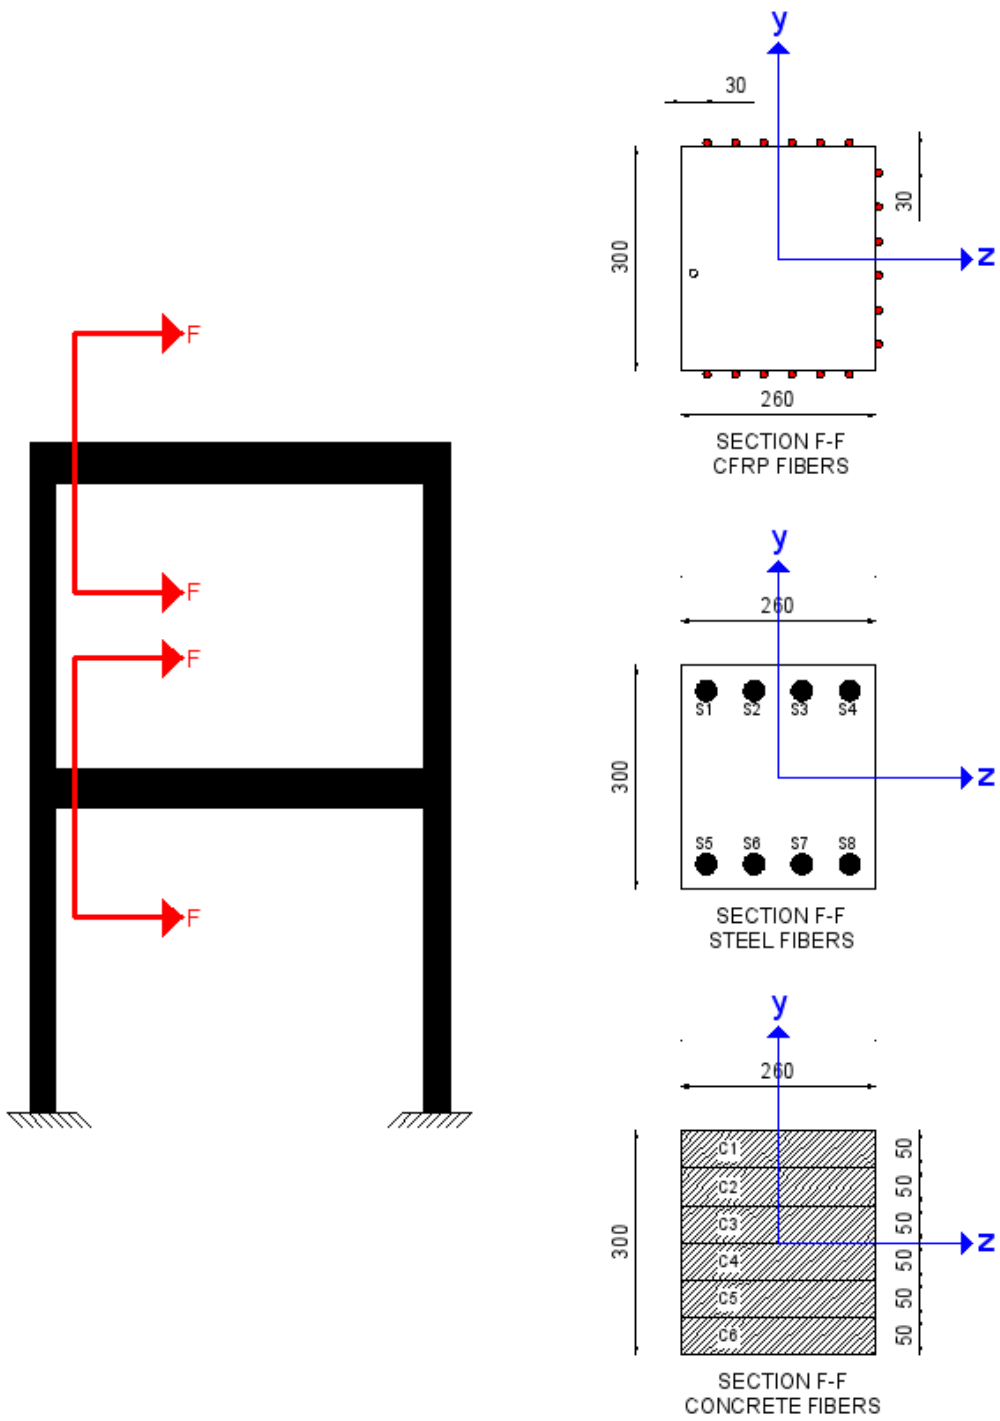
Fibers cross section for 1<sup>st</sup> and 2<sup>nd</sup> floor beams (300 · 260) in CFRP retrofitted frame.
